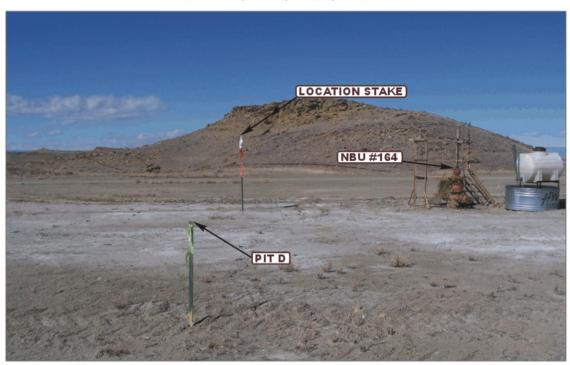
PHOTO: VIEW FROM PIT D TO LOCATION STAKE
